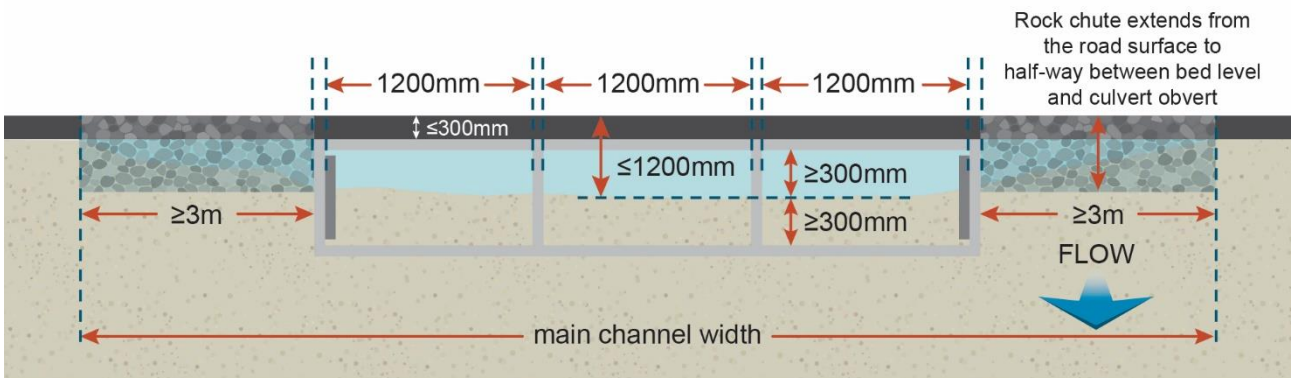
Culvert crossing option 3 (cross-section of waterway) – red waterway
